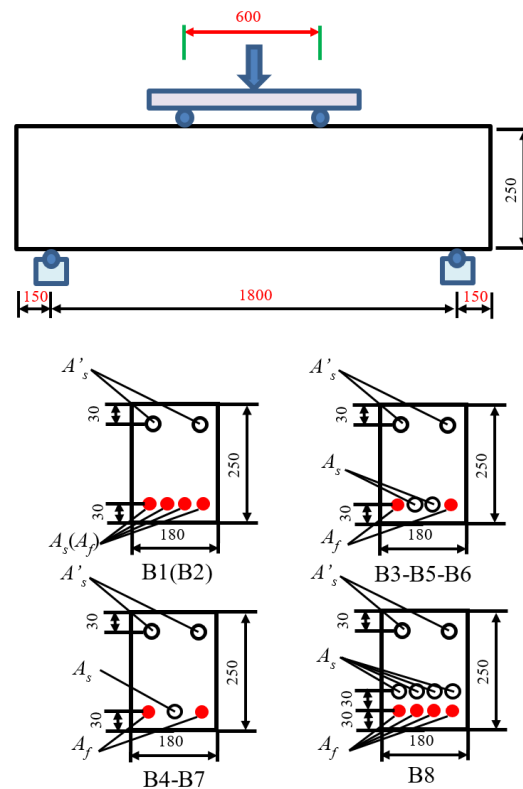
Geometrical dimension of the tested beams (Ou et al. 2009)
